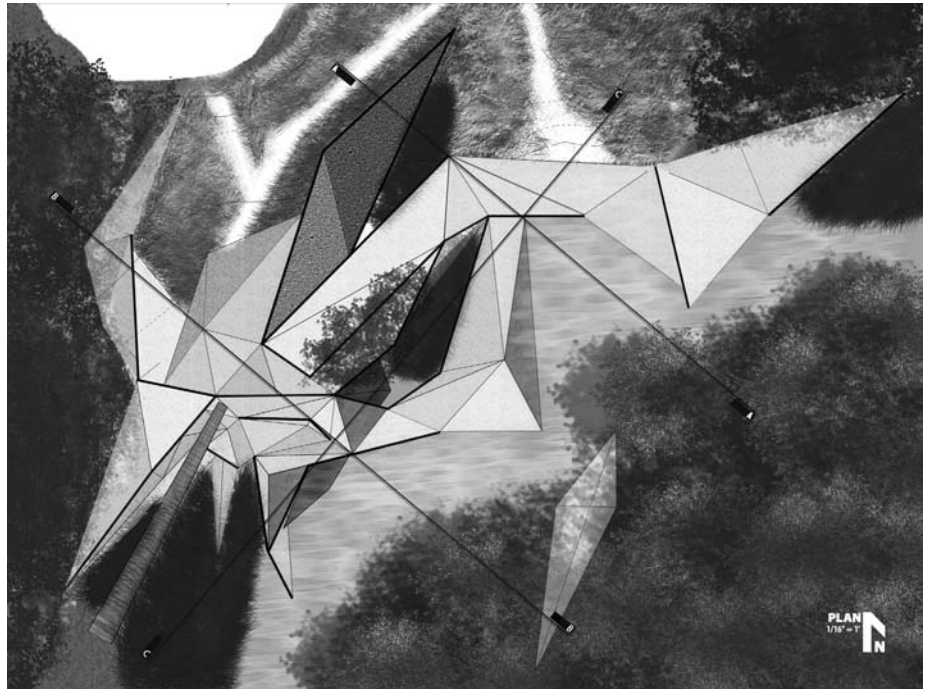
AutoCAD and Photoshop, Bayou Bienvenue site plan.
